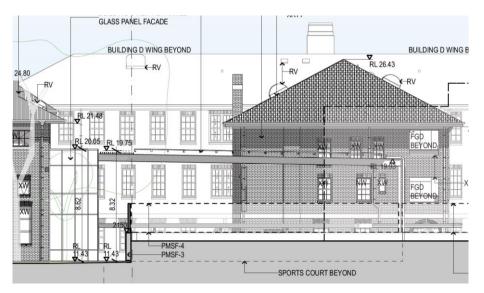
Extract from eastern elevation, showing proposed contemporary addition to the north of Building C2
